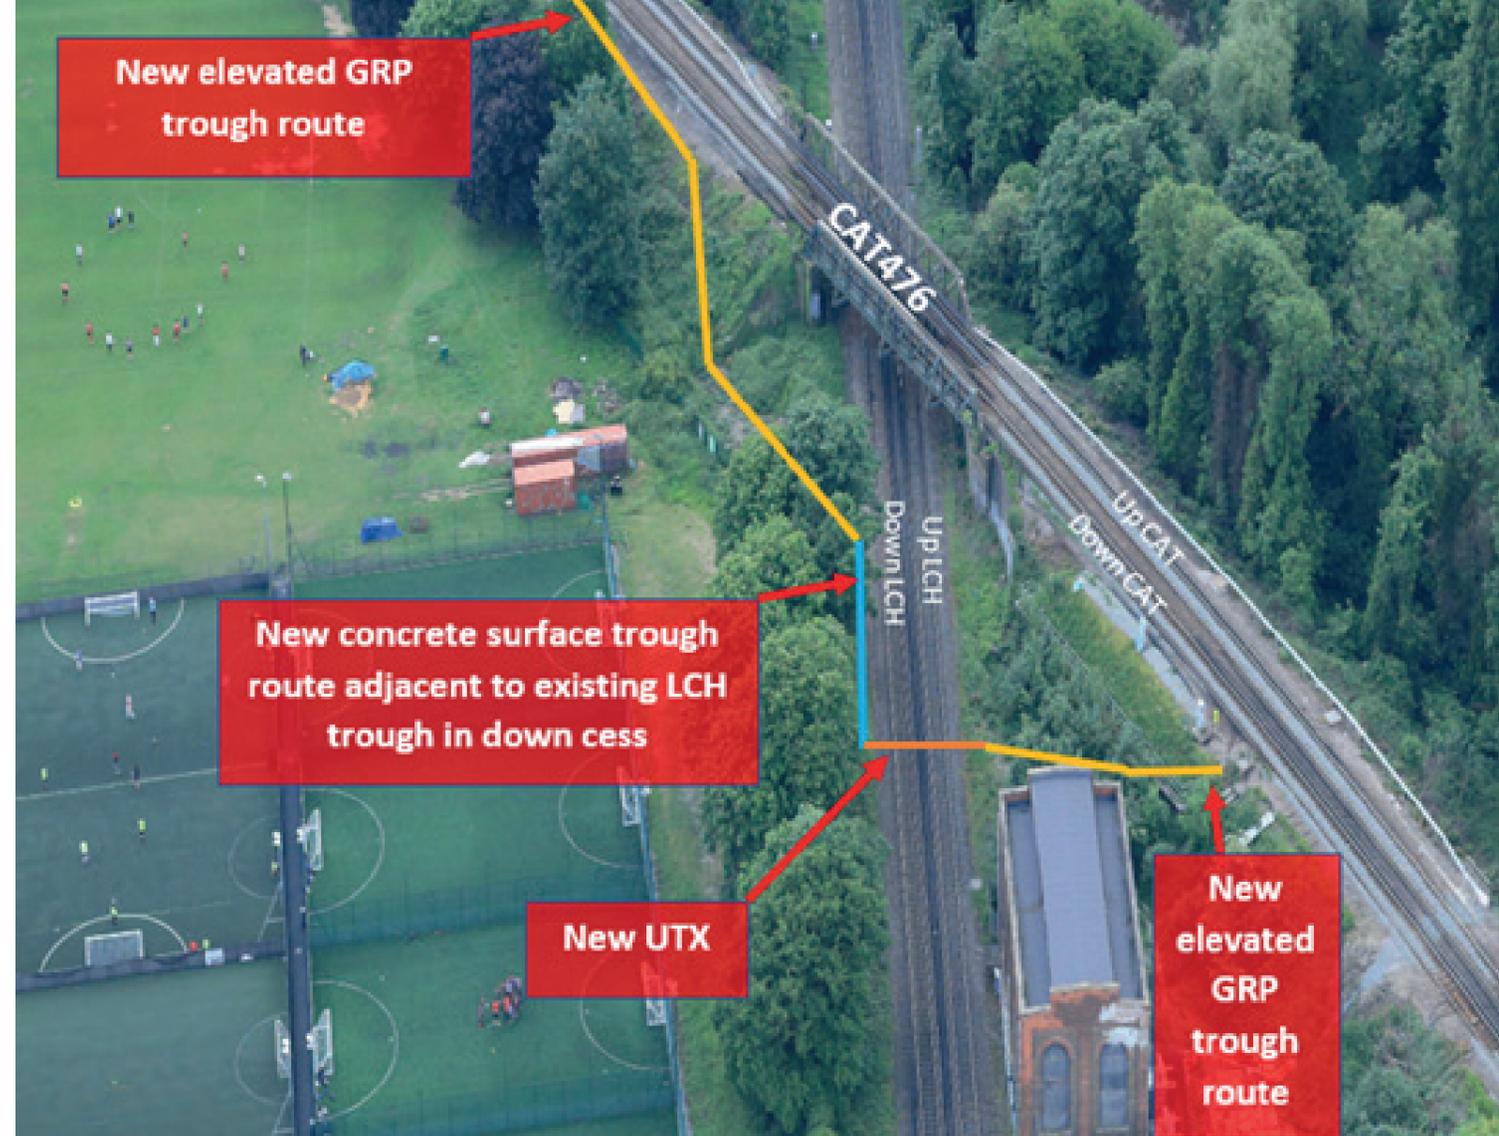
New route for existing services being diverted prior to replacement of intersection bridge.
